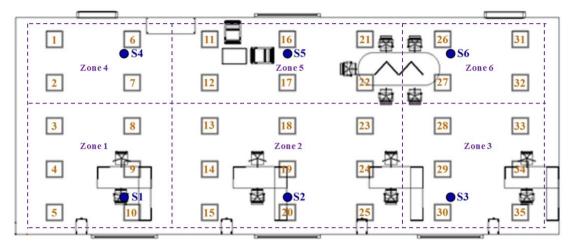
Luminaires and sensors layout for each zone of the office room [19]
